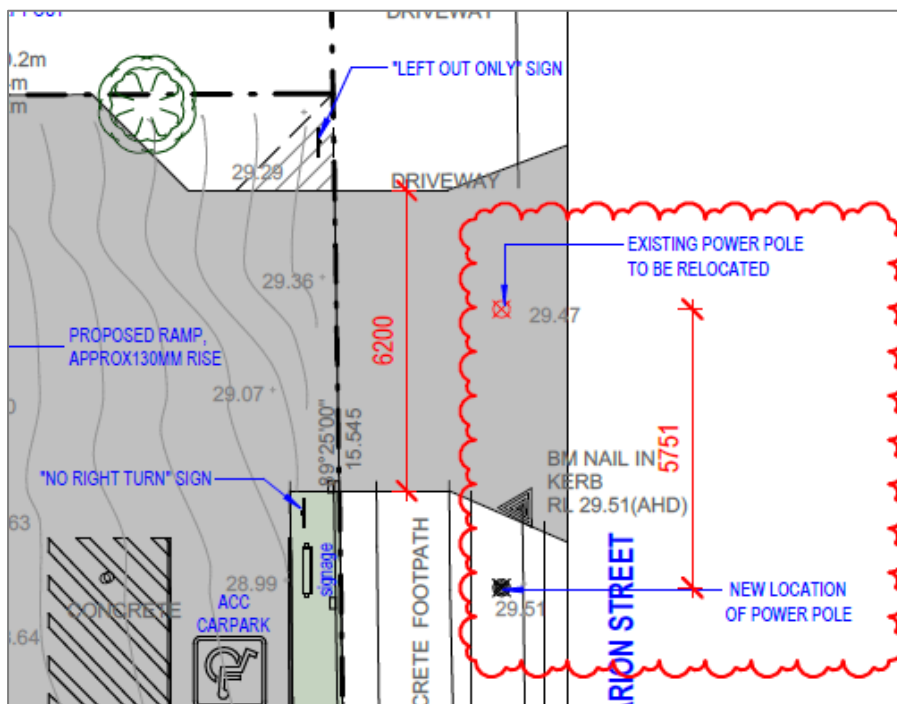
Extract of the Architectural Plans showing existing and new power pole location
